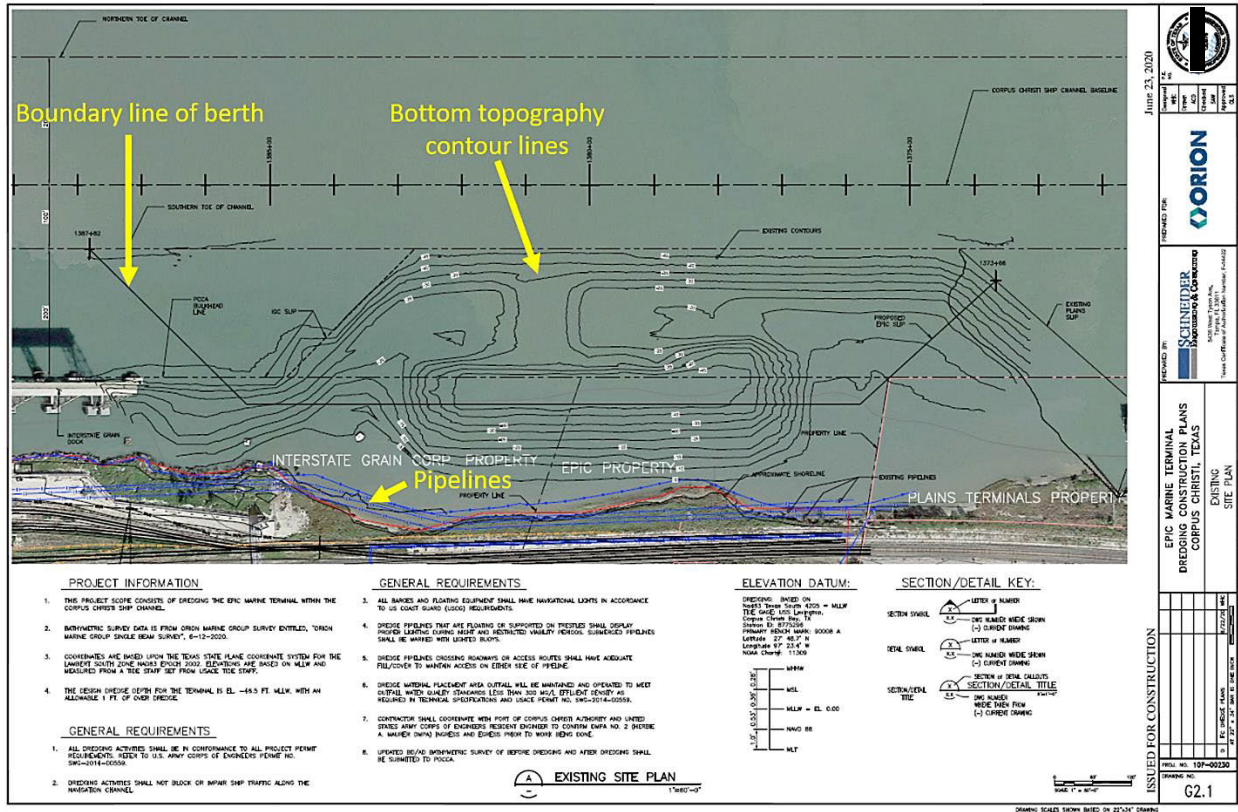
Existing Site Plan from EPIC East Dock dredging plans, with annotations in yellow by NTSB. (Source: Orion Marine Group)
